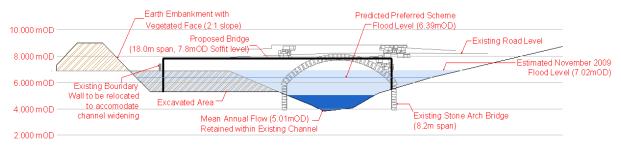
Proposed Works at Killeely Beg Bridge
